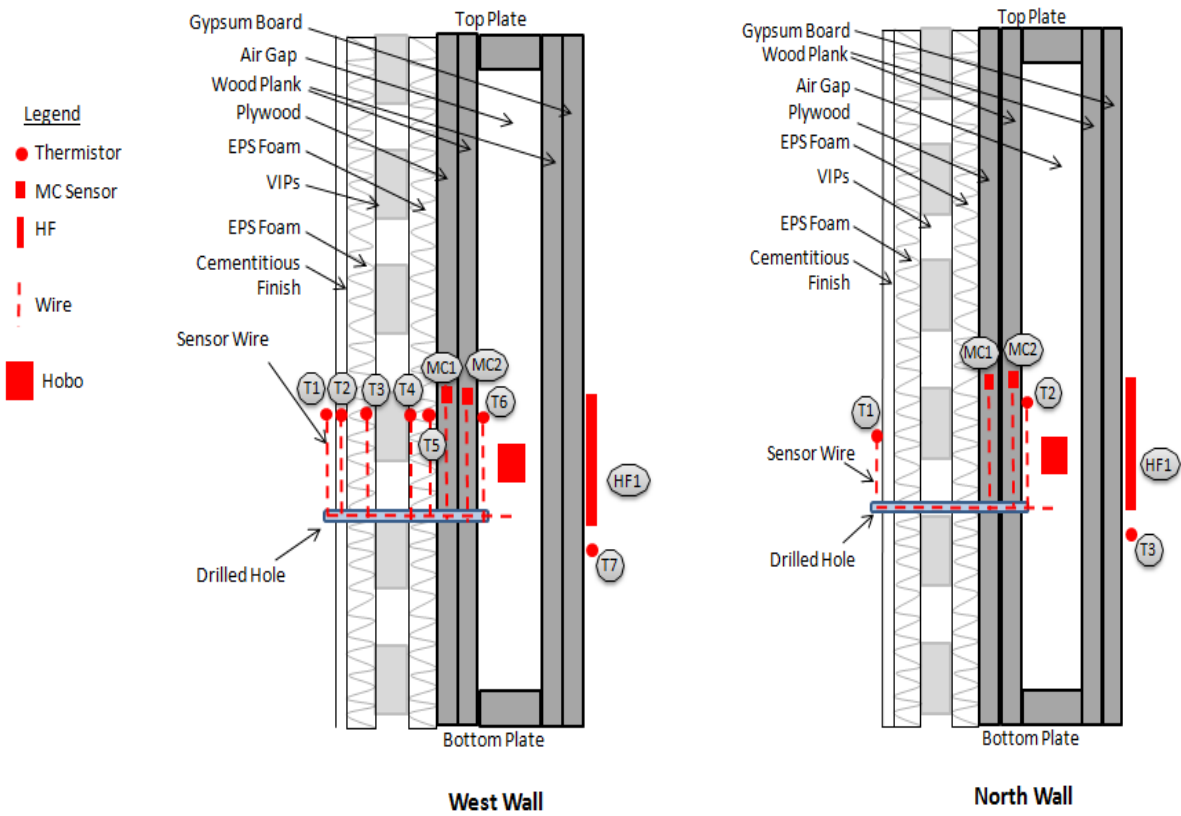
a) Section view of west wall sensor location, b) Section view of north wall sensor location
